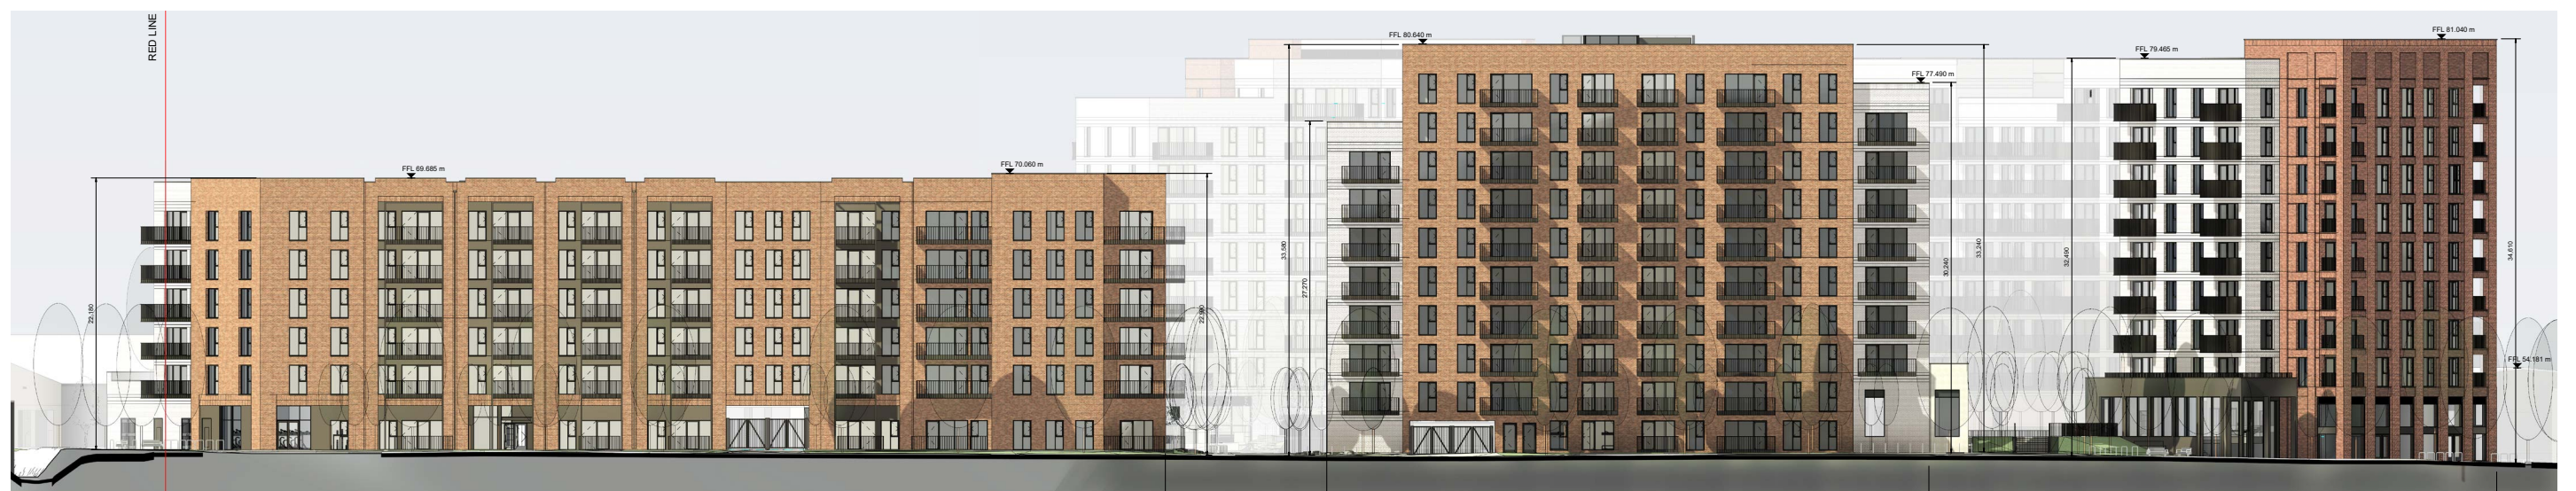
Site Elevation of Blocks B,C&D along The Parkmore Estate Road
